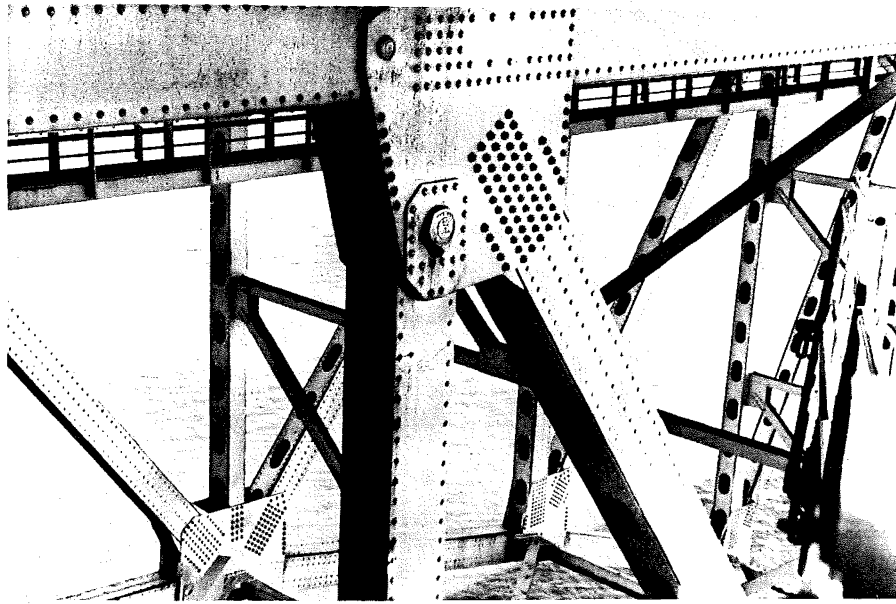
Crack in Riveted Deck Truss Hanger
